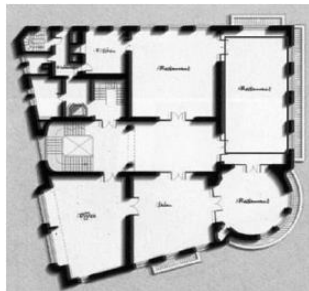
Floor Plan of The Second Level (Afifi, Amin, 2013,page 89)
